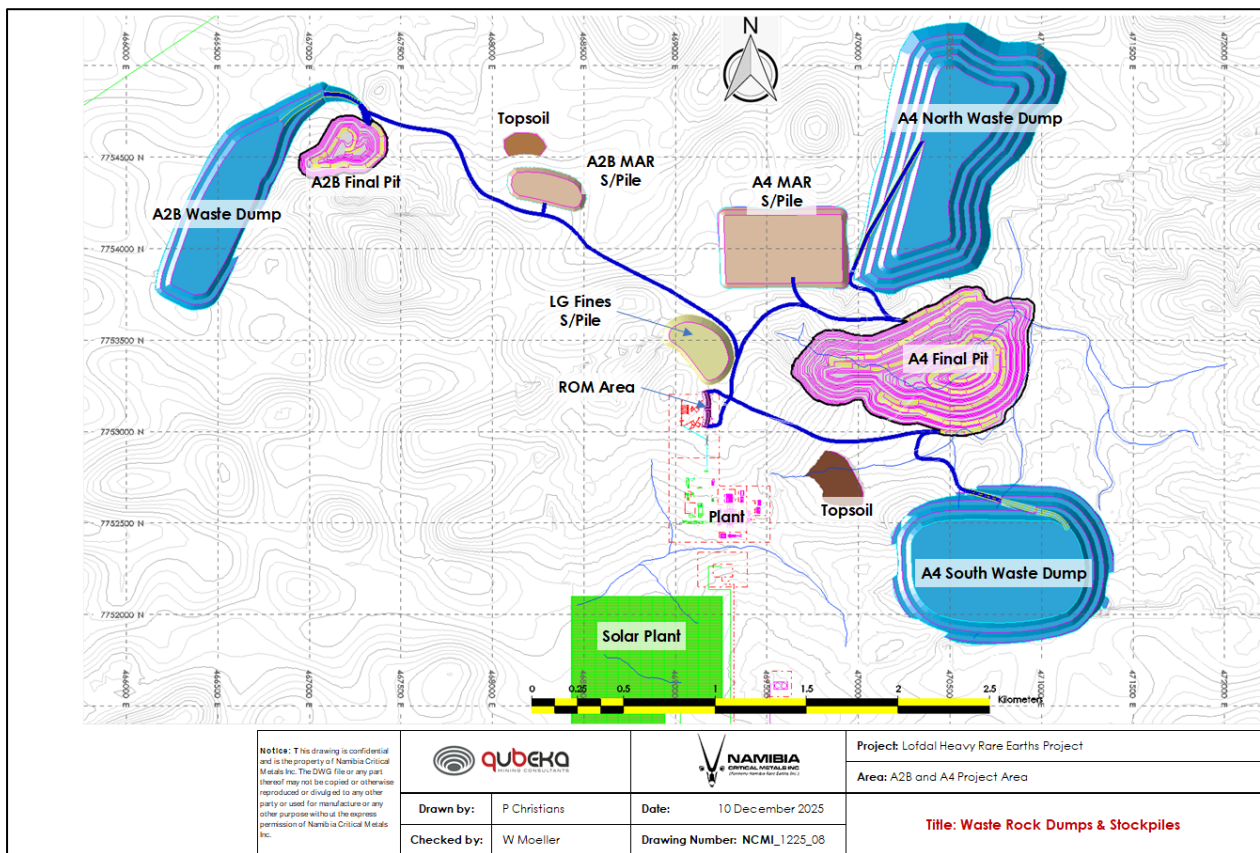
Layout of pits, haul roads and waste rock dumps of Lofdal "2B-4"
